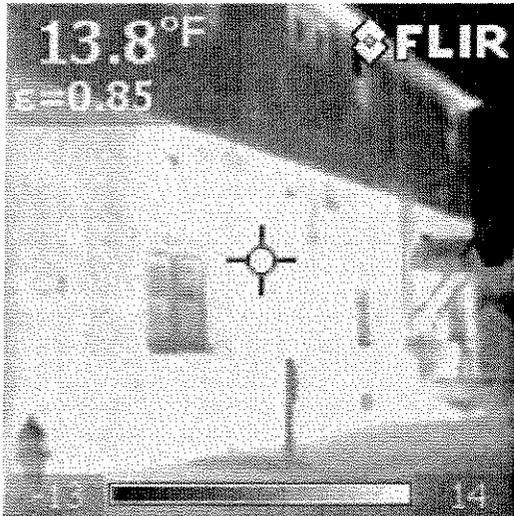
York Village Fire: Block wall leaks heat much more than frame wall.
